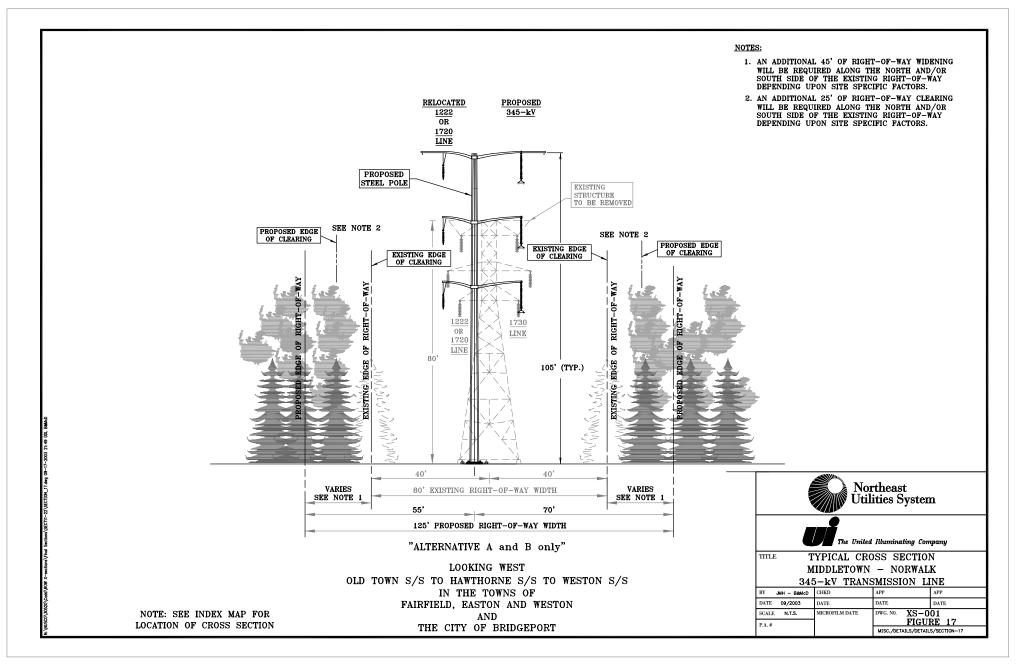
Cross section 17 - Old Town to Hawthorne to Weston Substations (Fairfield, Easton, Weston, Bridgeport)
